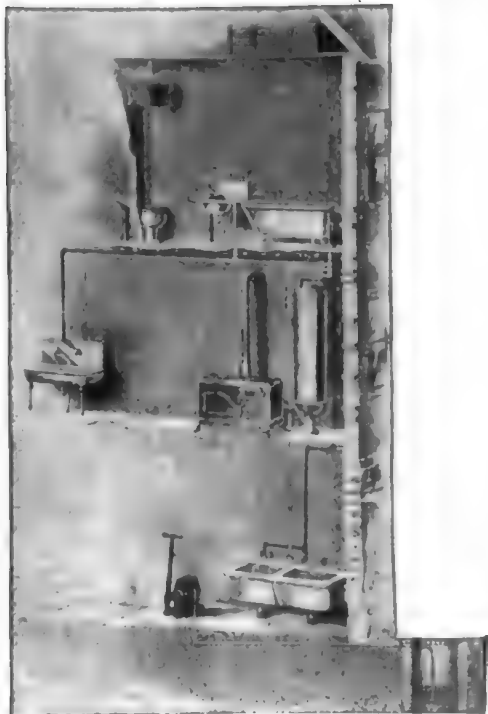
Typical layout of running water system. Hand operated pump is used in this case to take water from well and force it to gravity tank in attic.
